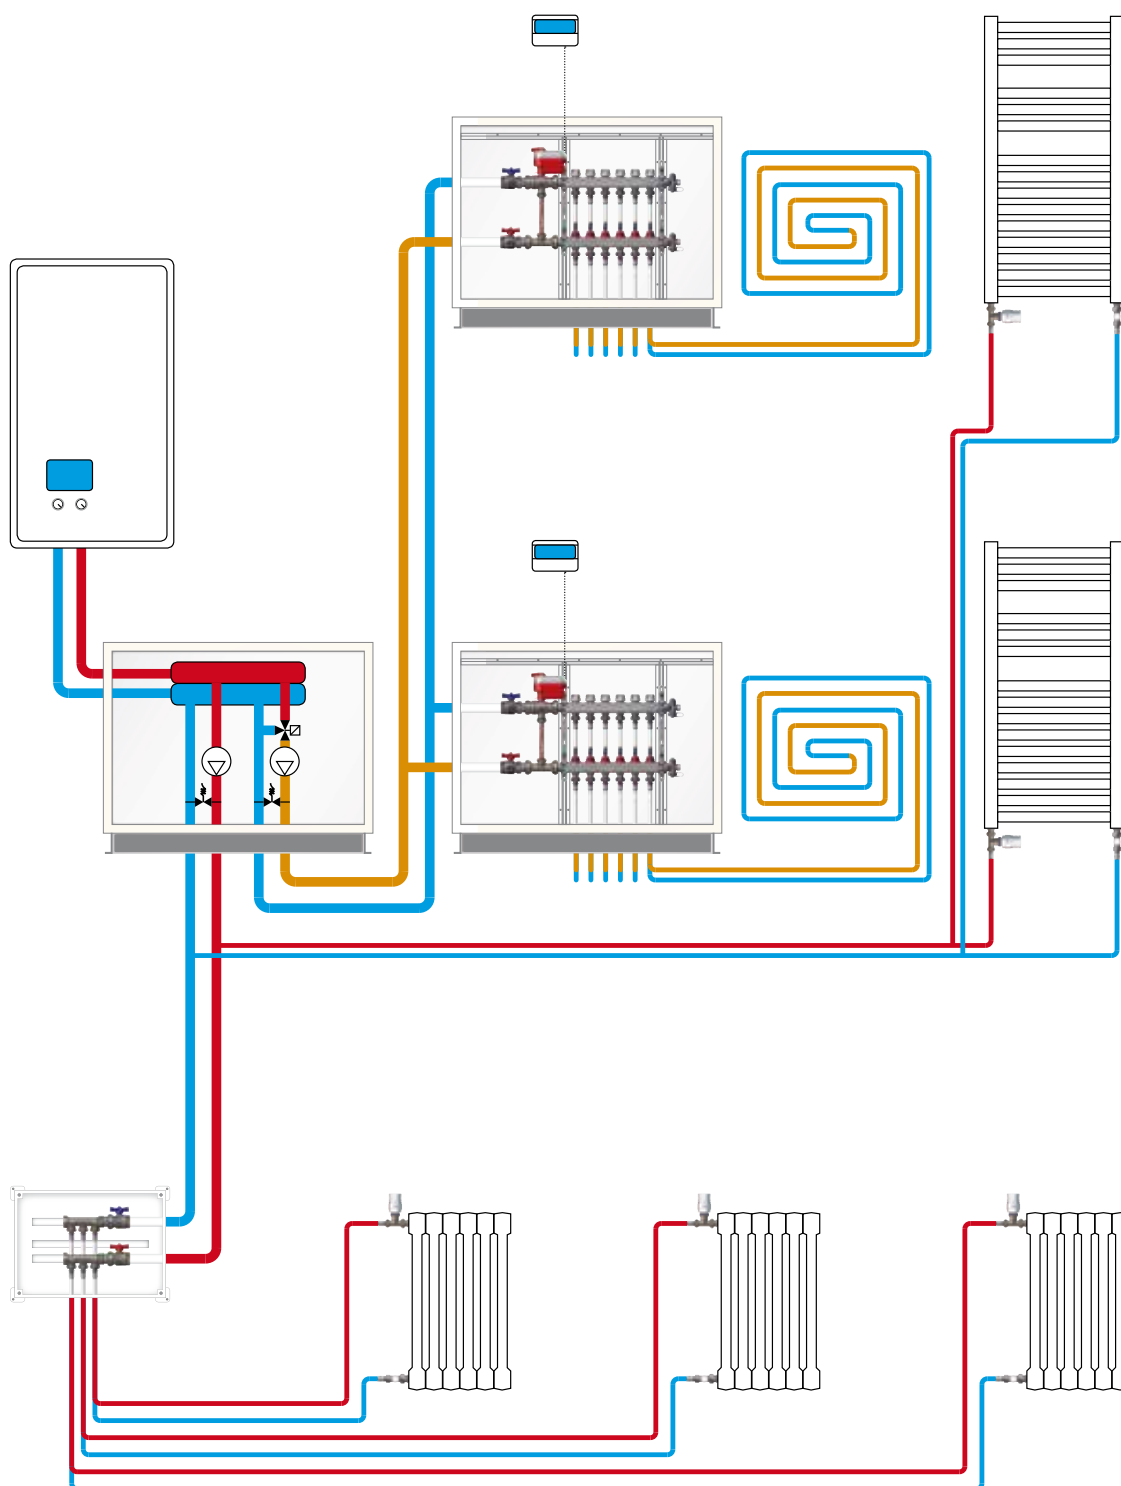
Stainless steel manifold - Condensing boiler and hydraulic separation manifold
